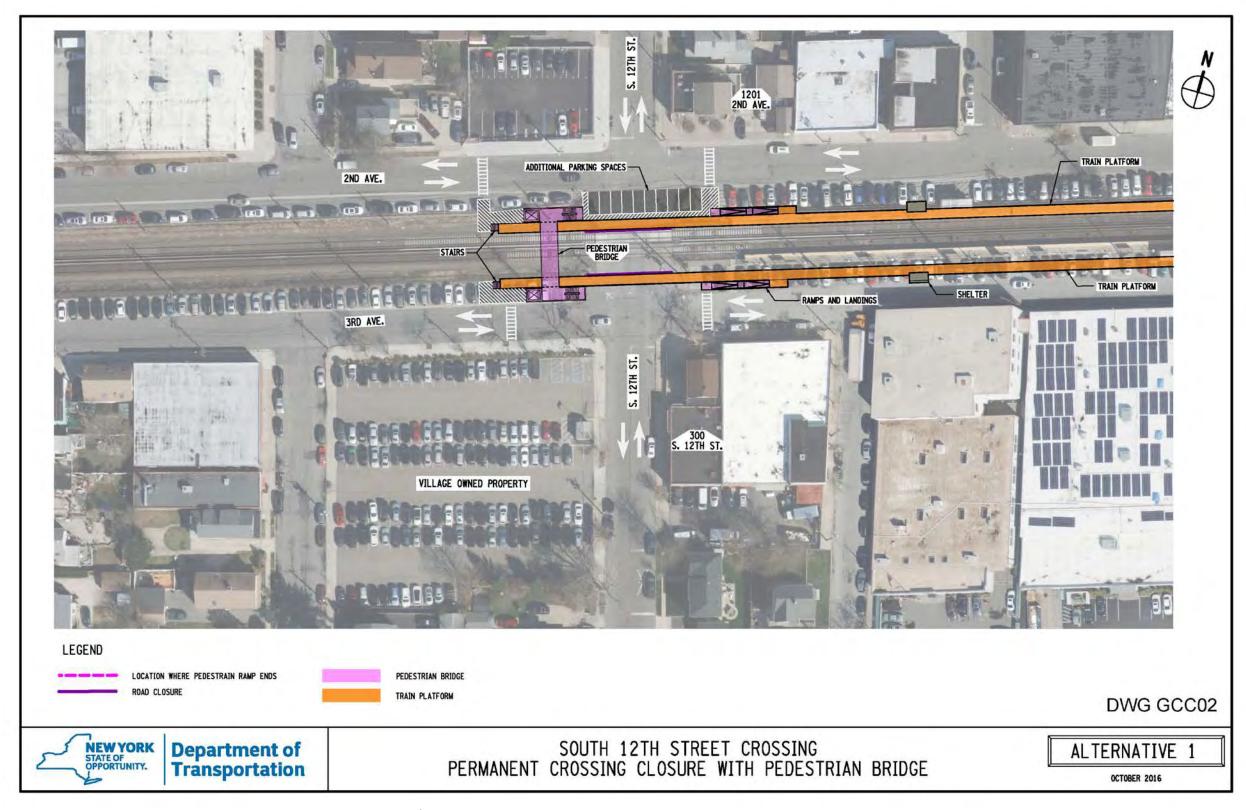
South 12th Street Crossing (Alternative 1: Permanent Crossing Closure with Pedestrian Bridge)
